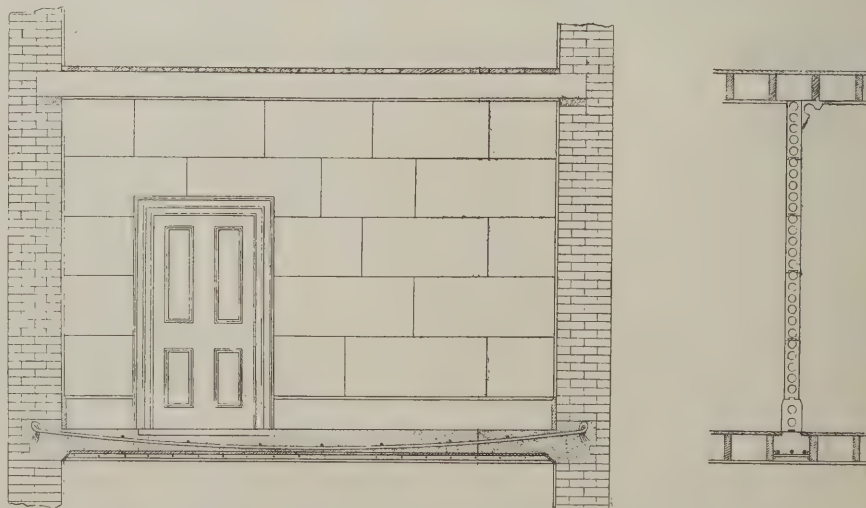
WILKINSON'S 1854 HOLLOW PARTITION AND SUPPORTING BEAM.
